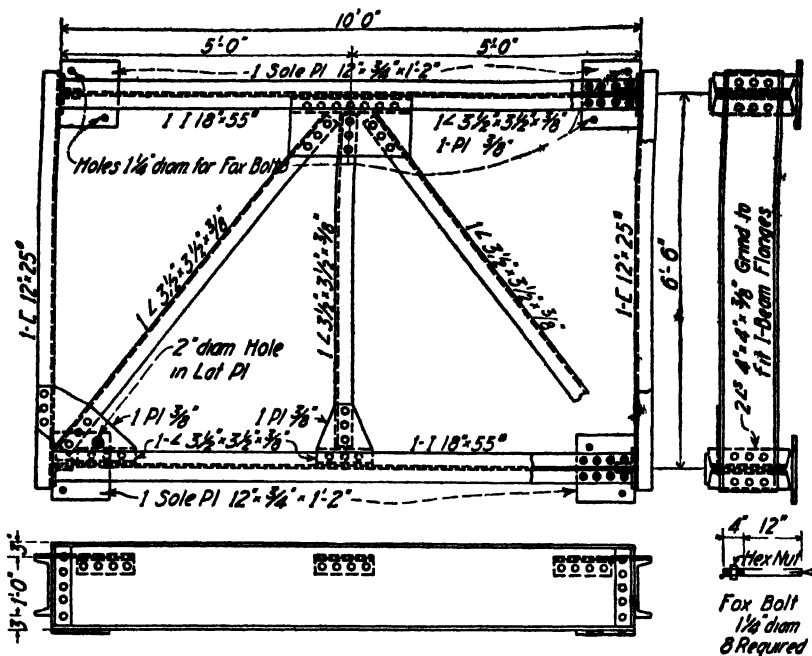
Details of a Railway, I-beam Span with Two Stringers per Track.
